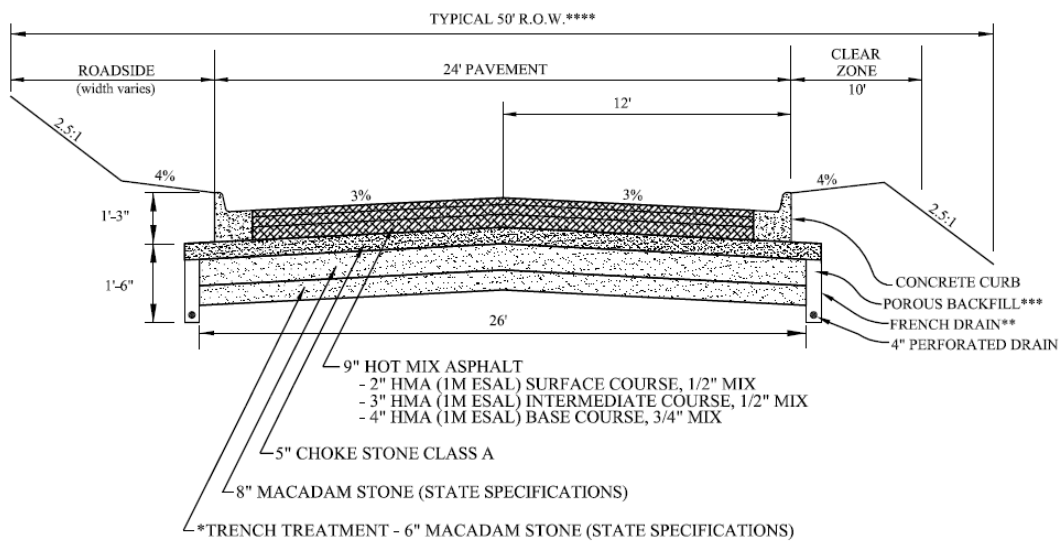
CONSERVATION SUBDIVISION: TYPICAL MINIMUM H.M.A. PAVEMENT - CLOSED DITCH SECTION
